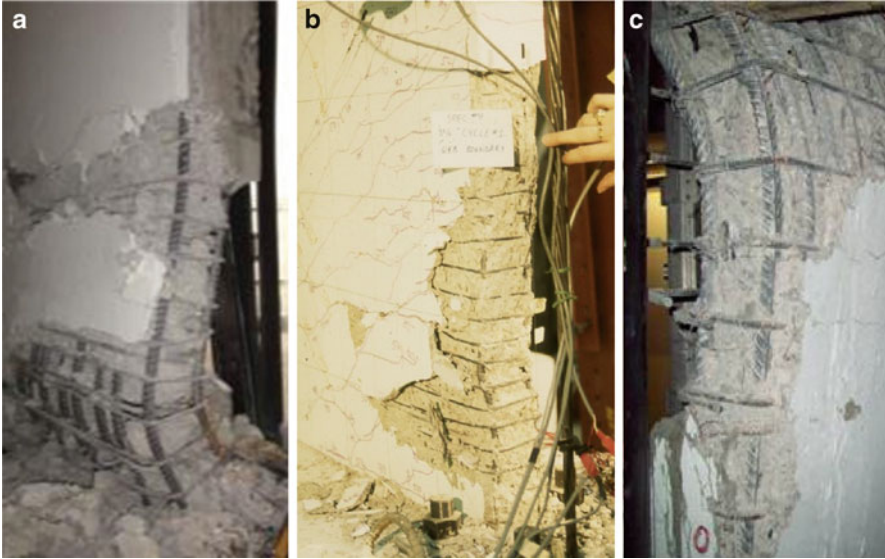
(a) Wall failure in 2011 Christchurch earthquake (Elwood 2011). (b) Specimen TW2 web boundary failure (Thomsen and Wallace 2004). (c) Wall failure in 2010 Chile earthquake
